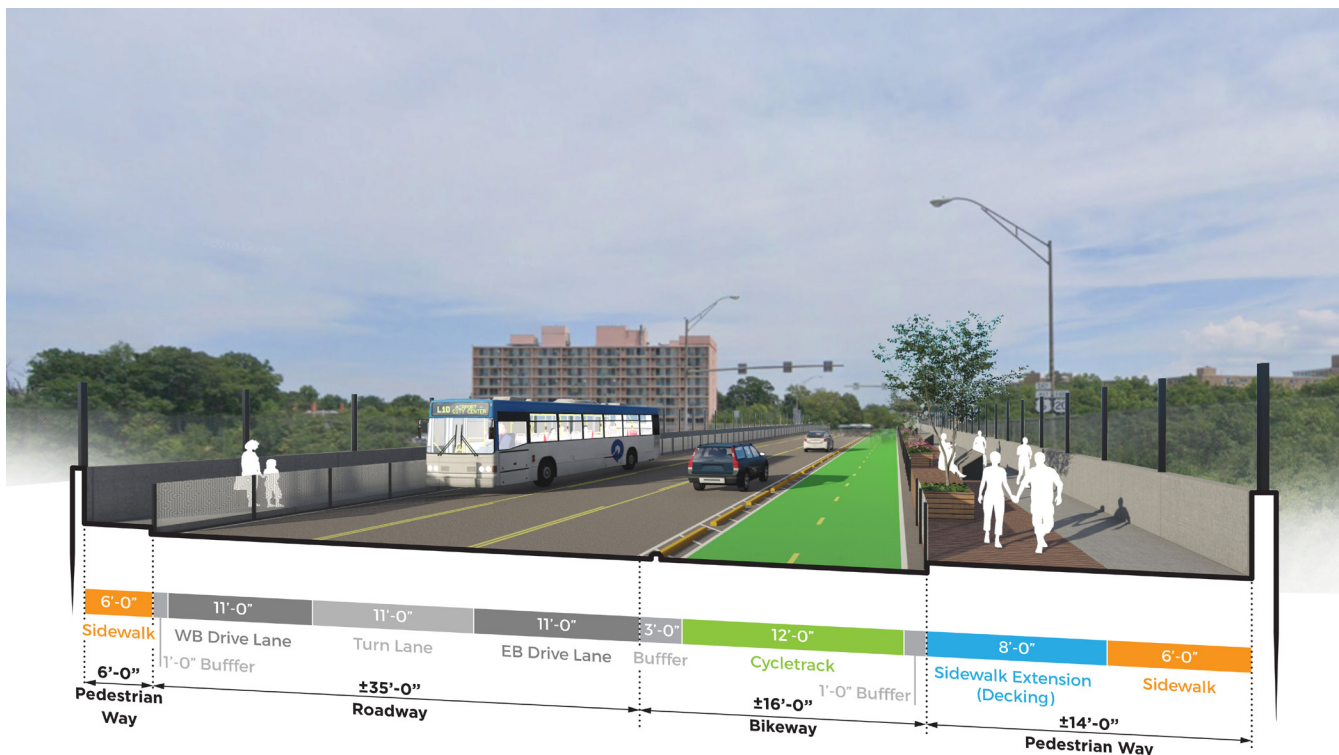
Detroit Road Bridge Section (looking eastbound)
